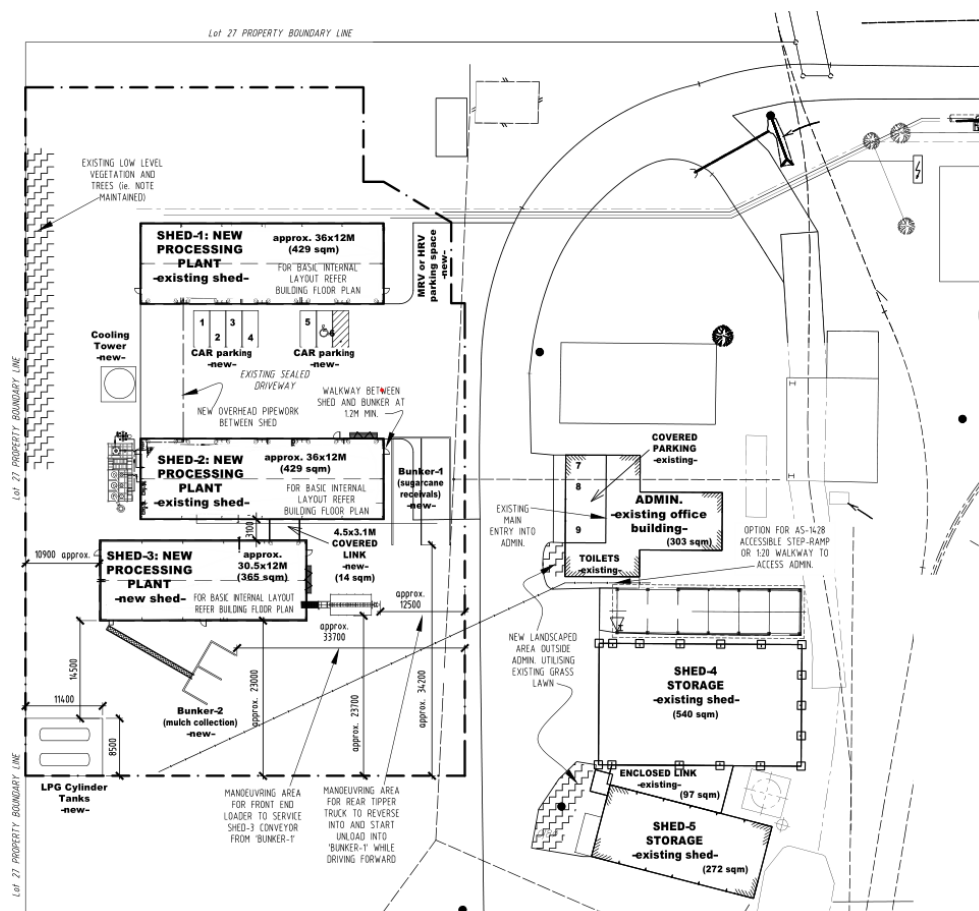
Proposed Development Layout (Source: Gregory G Terzi Building Design & Drafting)
